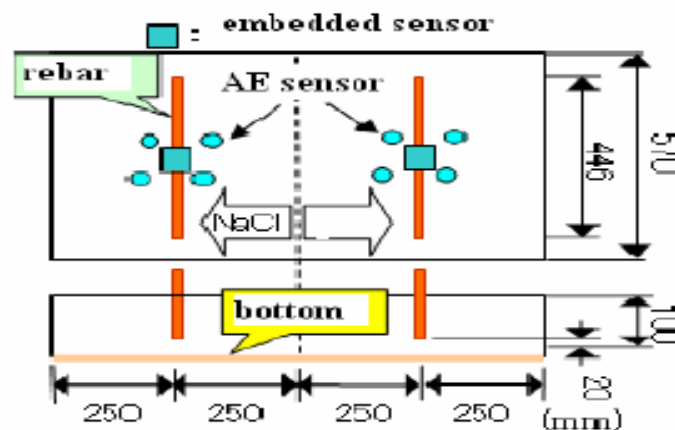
Sketch of reinforced concrete slab tested (Ohtsu et al., 2010)
